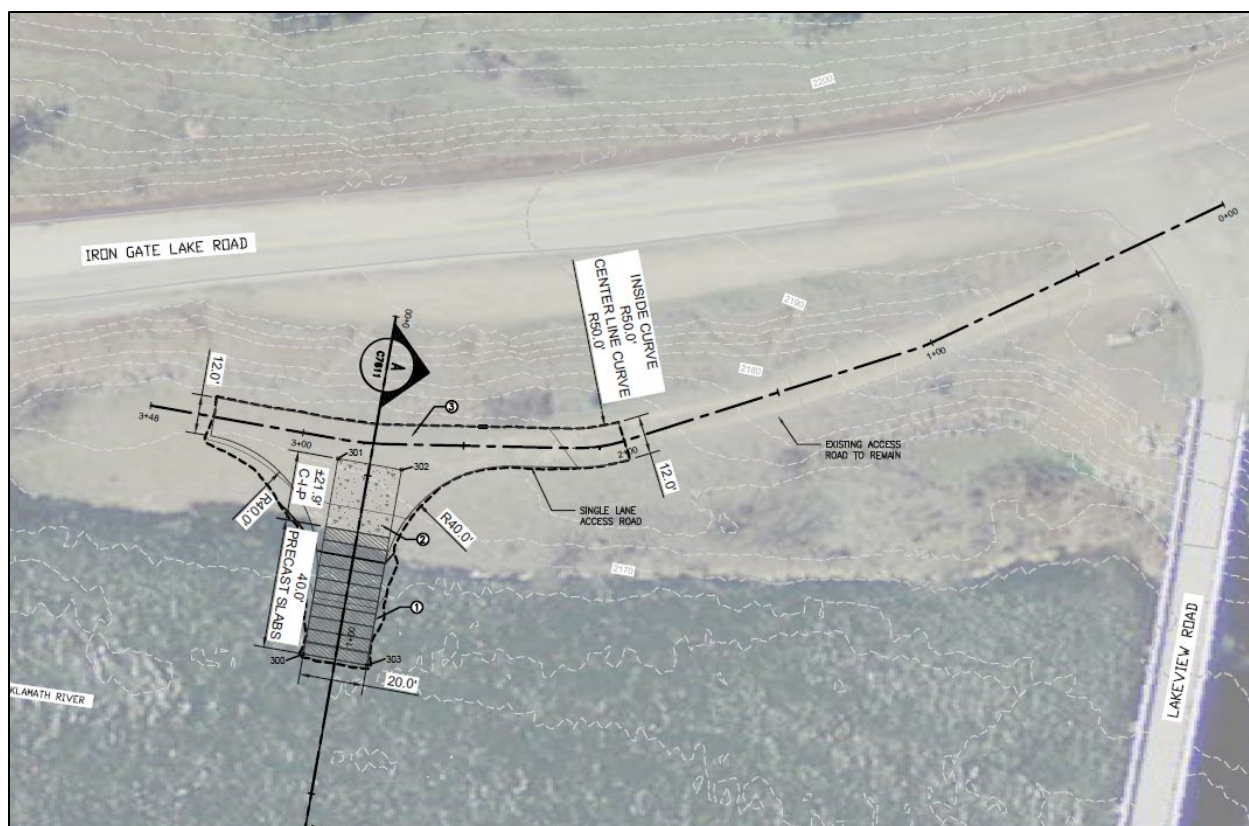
Iron Gate Fire Access Ramp. Plan view provides example of boat ramp construction for other sites (FERC 2021a)
